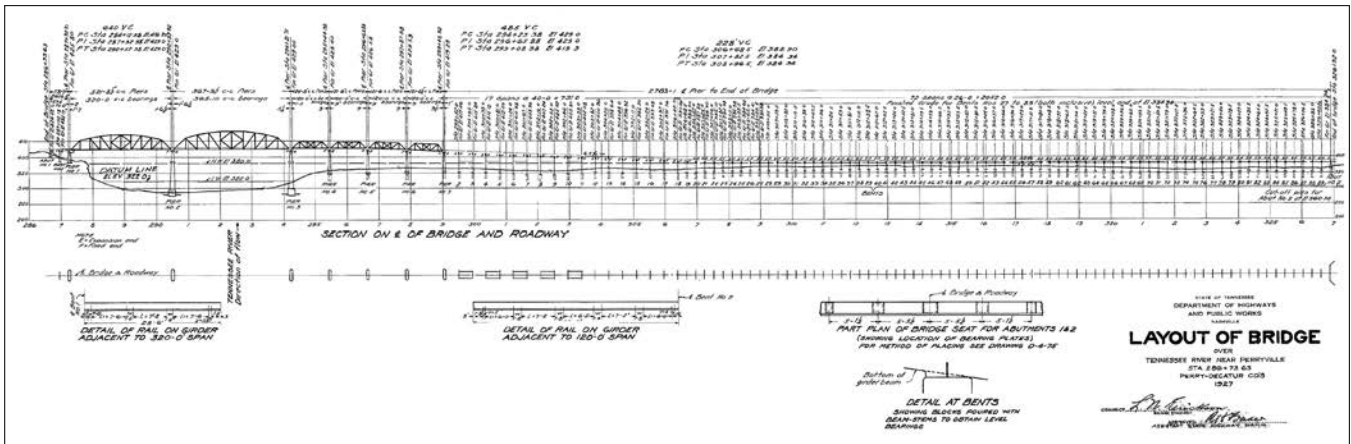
Drawing, Elevation, Alvin C. York Bridge, 1927
